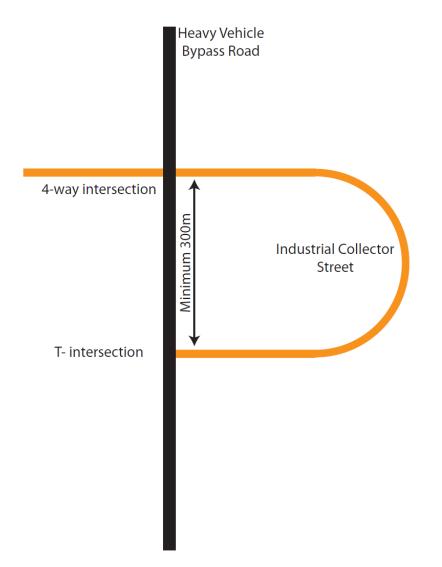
Access arrangements to the Heavy Vehicle Bypass Road
